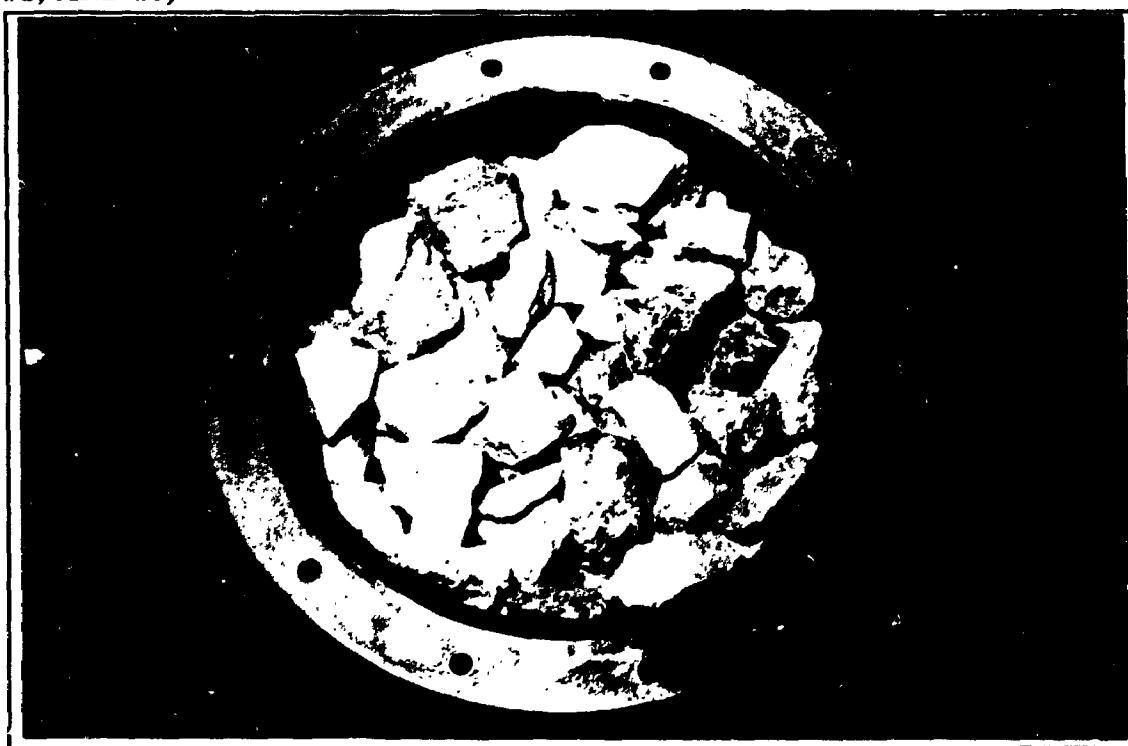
ADDITIONAL 50 mm STONE PLACED TO FILL CYLINDER (TESTS #1, #2, AND #3)
